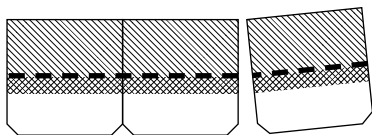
Shadow Ridge accessory shingles detach easily from three-piece units to make 72 individual cap pieces.
